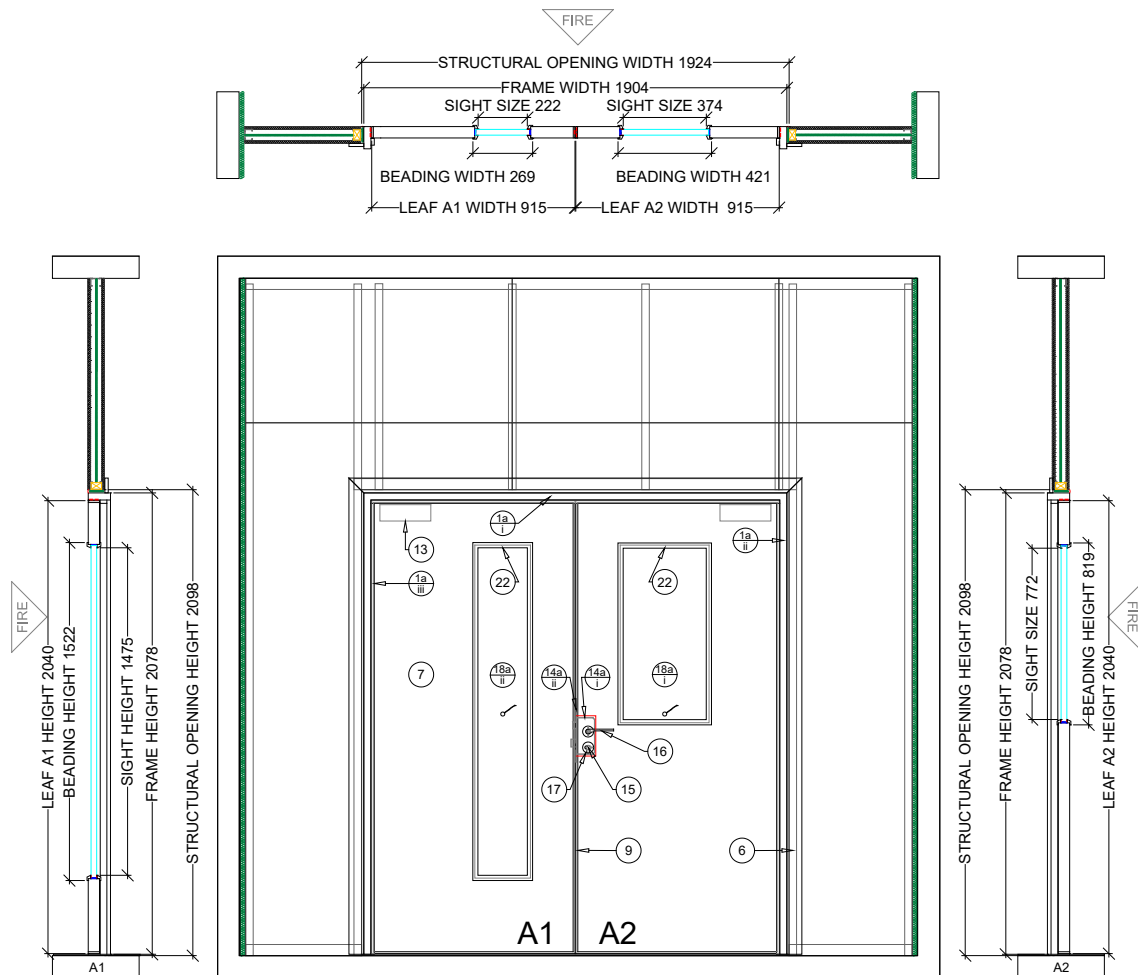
General arrangement of test construction viewed from the unexposed surface
